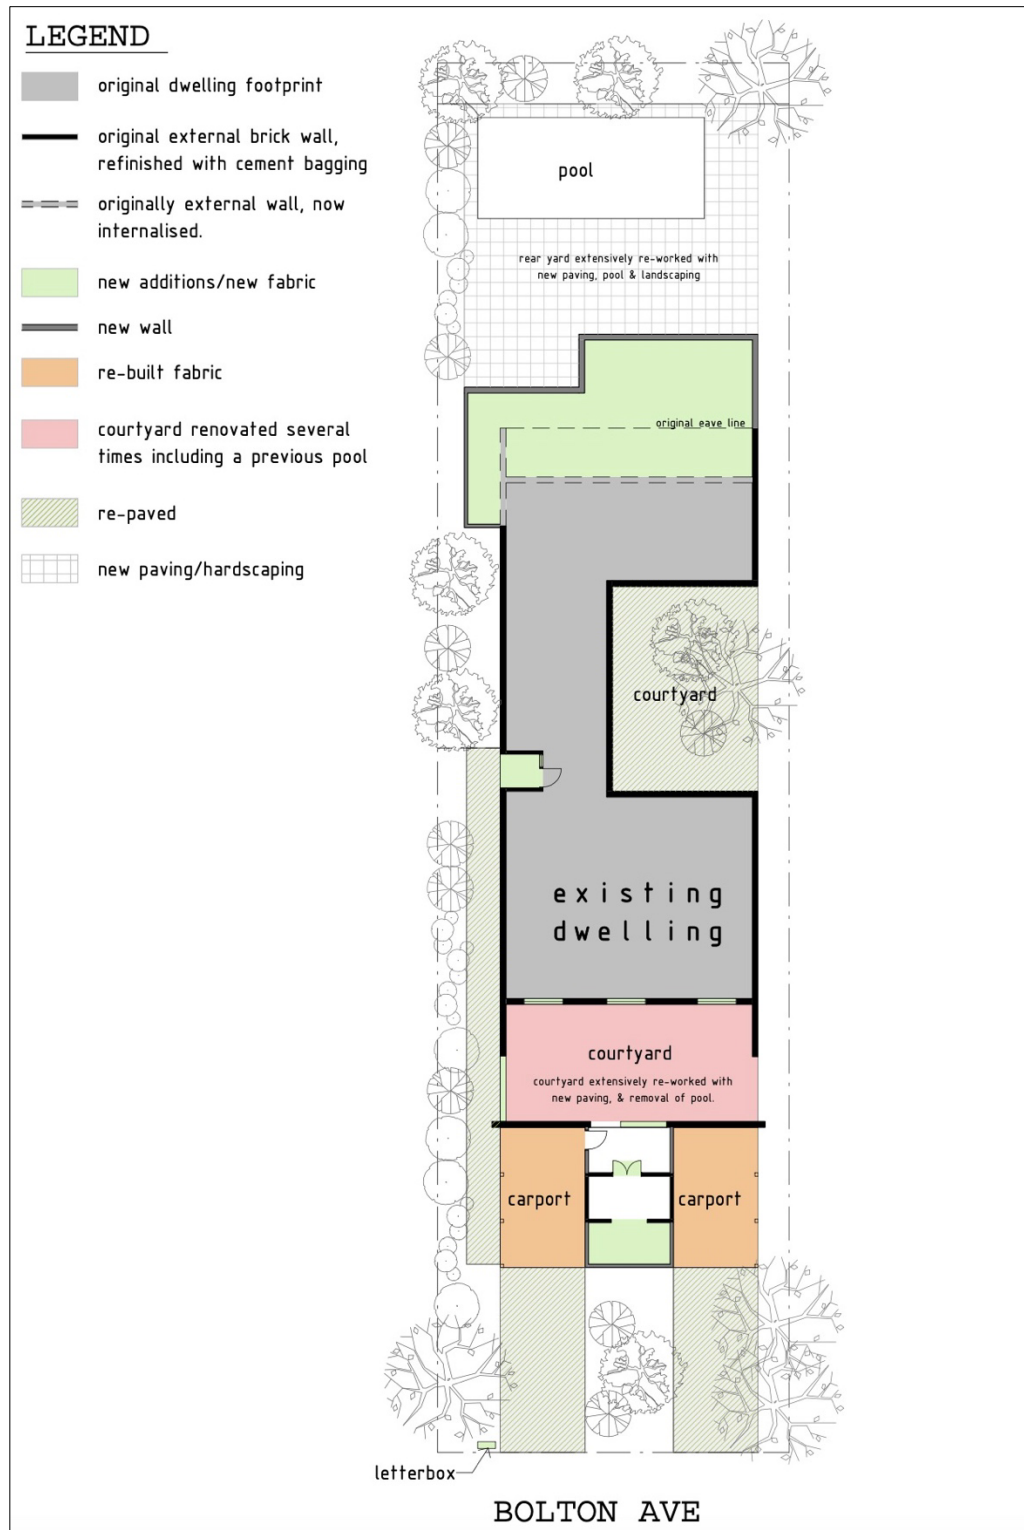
Site plan that illustrates the extent of change to the built form and the landscape. Not indicated is the fact that the original external brick walls have been bagged and painted, a substantial change from the original face brick character. Plan produced by BRPL.
